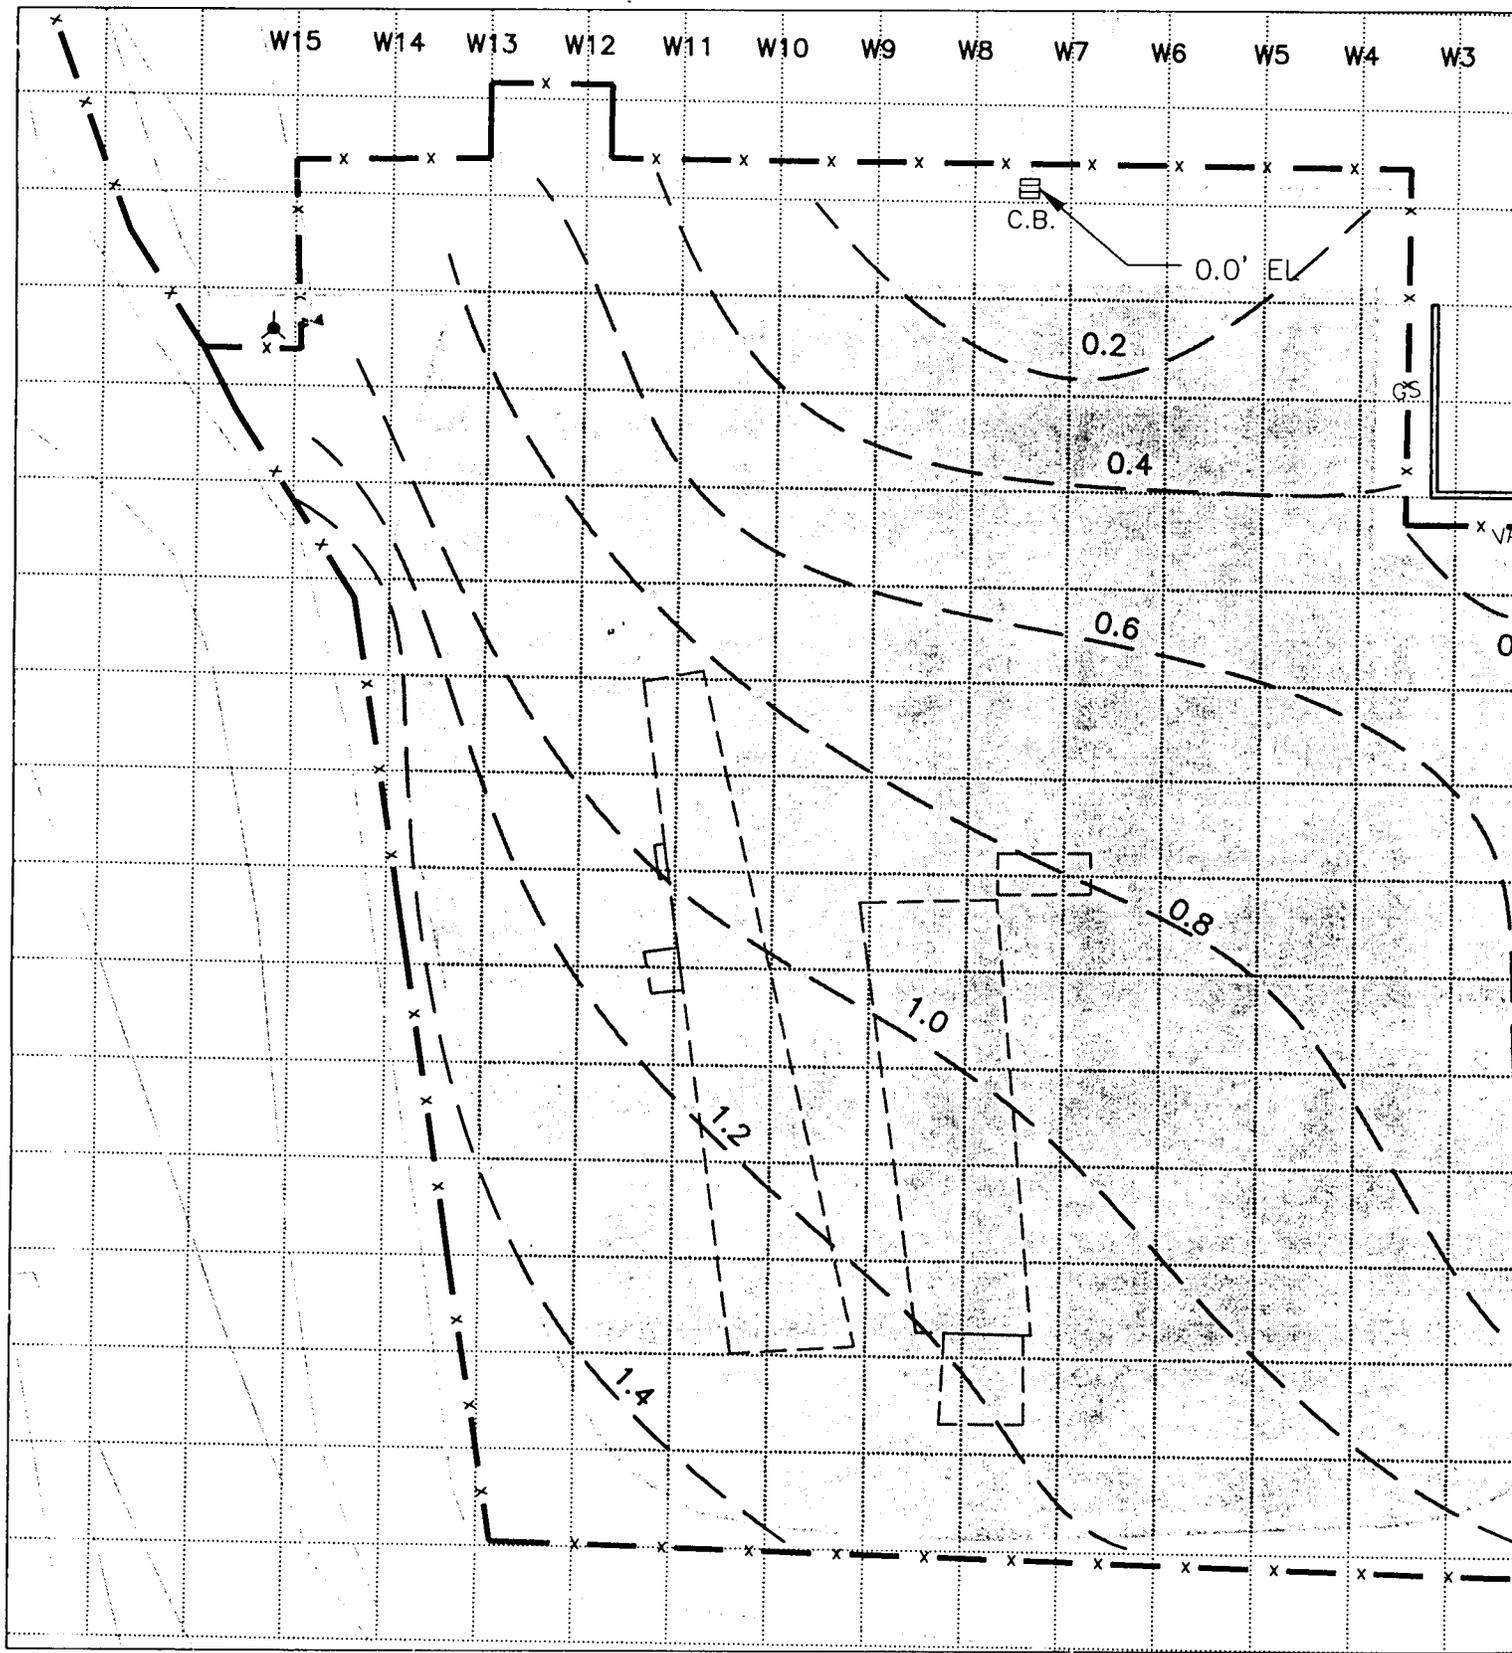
Conceptual Grading Plan for the Southwest Trenches Area, LEHR, Southwest Trenches, UC Davis, Cal
